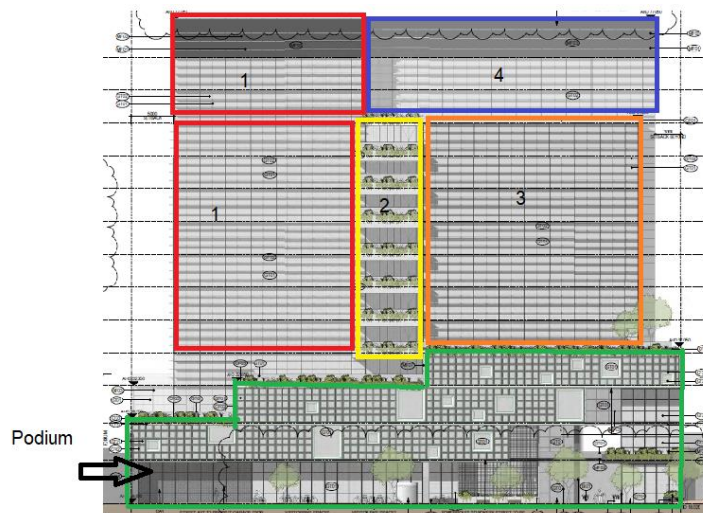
Elements of building as perceived from Rokeby Street to the west.
